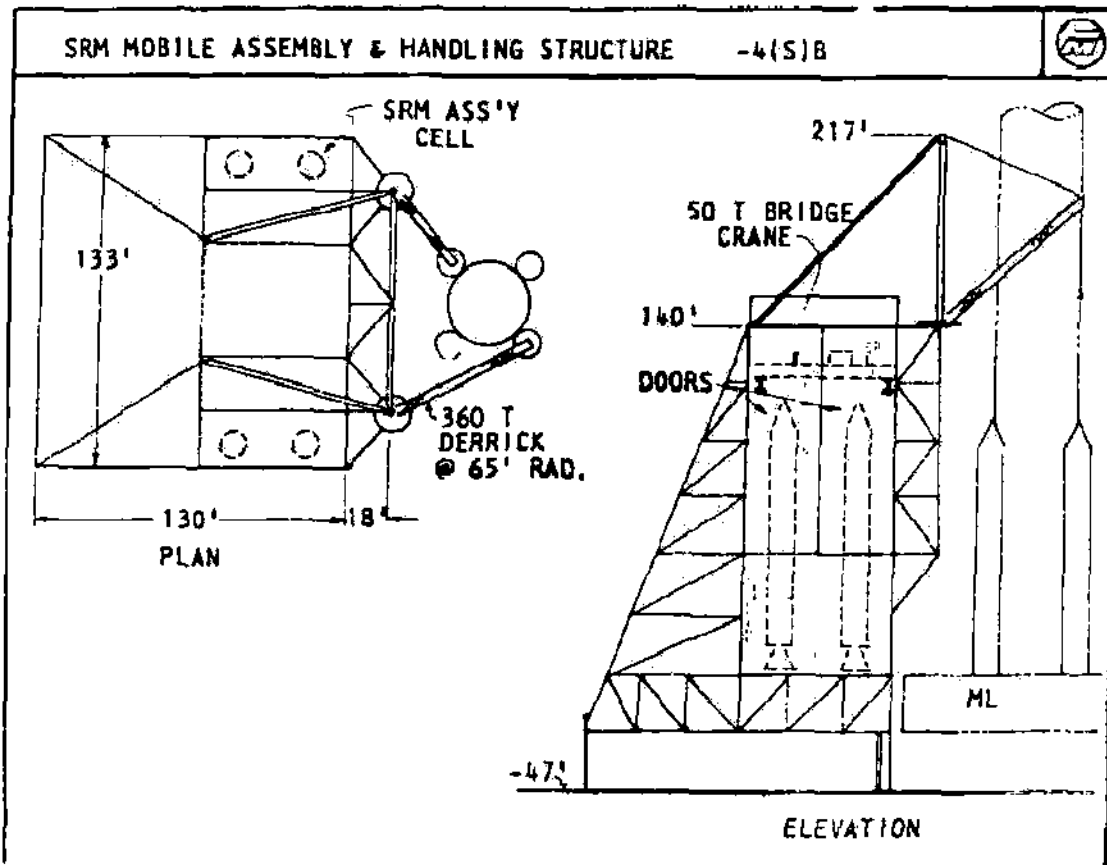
MOBILE ASSEMBLY AND HANDLING STRUCTURE
